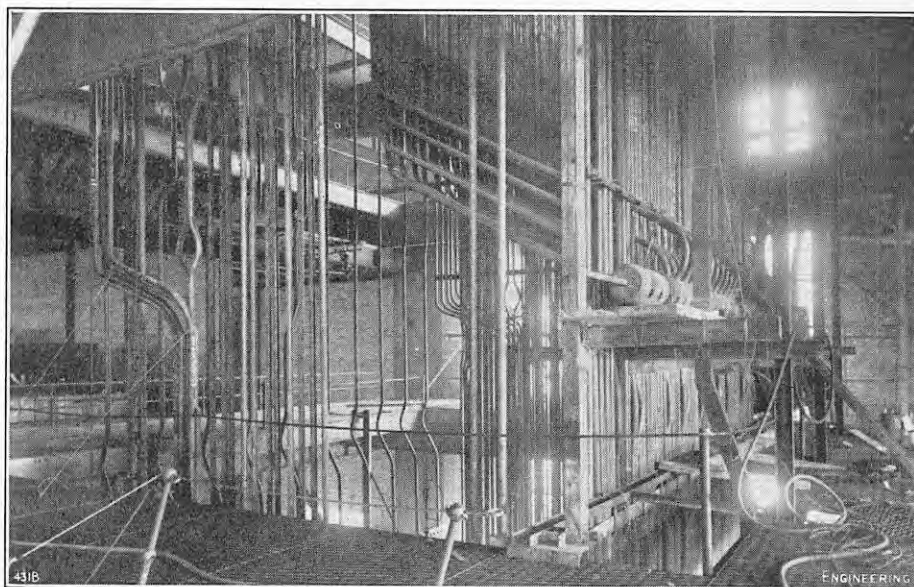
CONVECTION TUBES OF NO. 1 BOILER.
